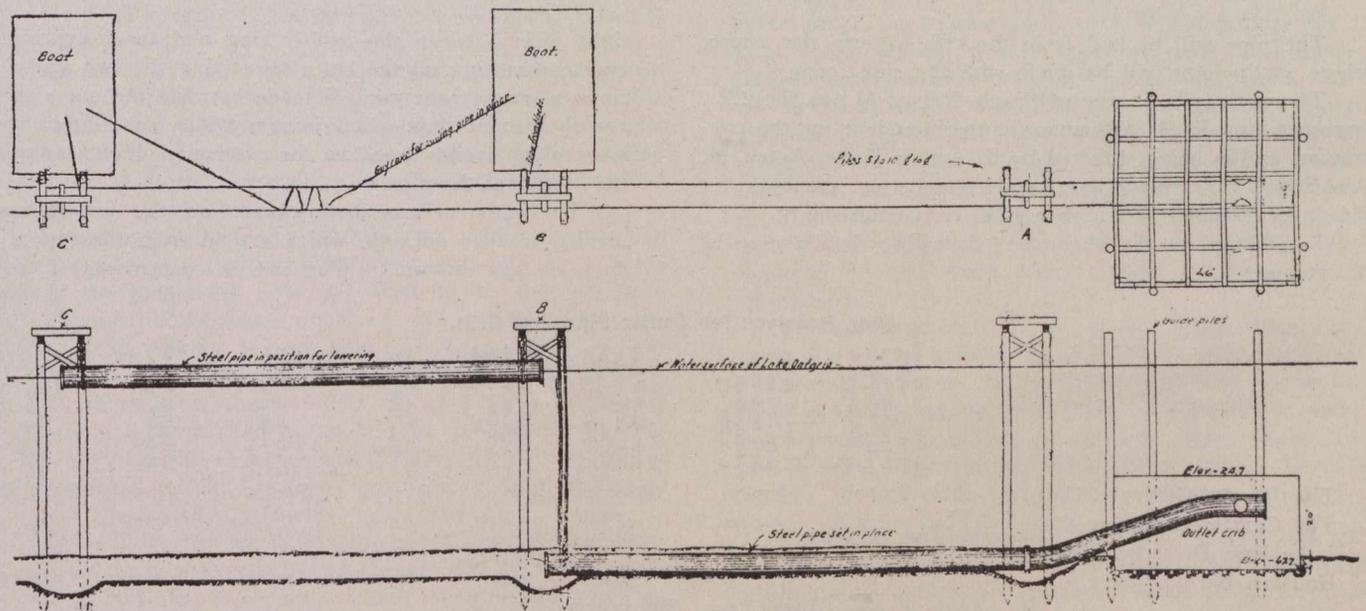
Proposed Method of Laying Outlet Pipe from Crib to Shore.
